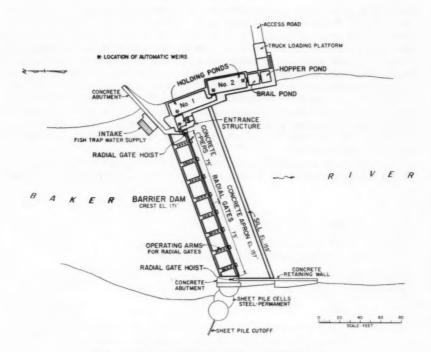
PLAN OF BARRIER DAM AND FISH TRAP
